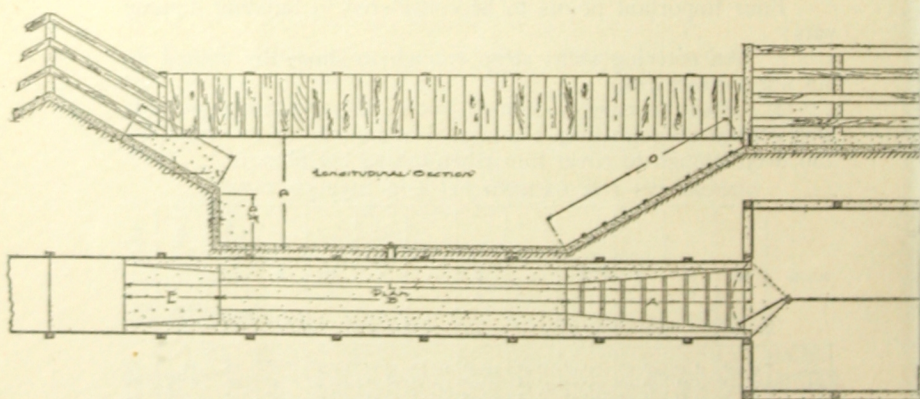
Side Elevation and Plan Concrete Dipping Vat.
